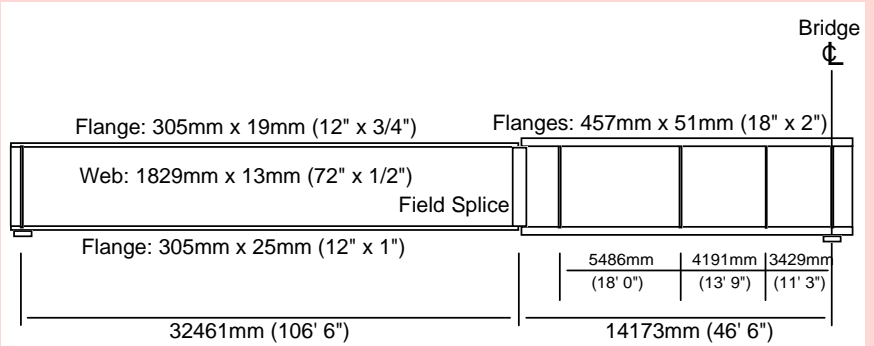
Elevation View of 9 Girder 345W (50W) Steel Bridge
